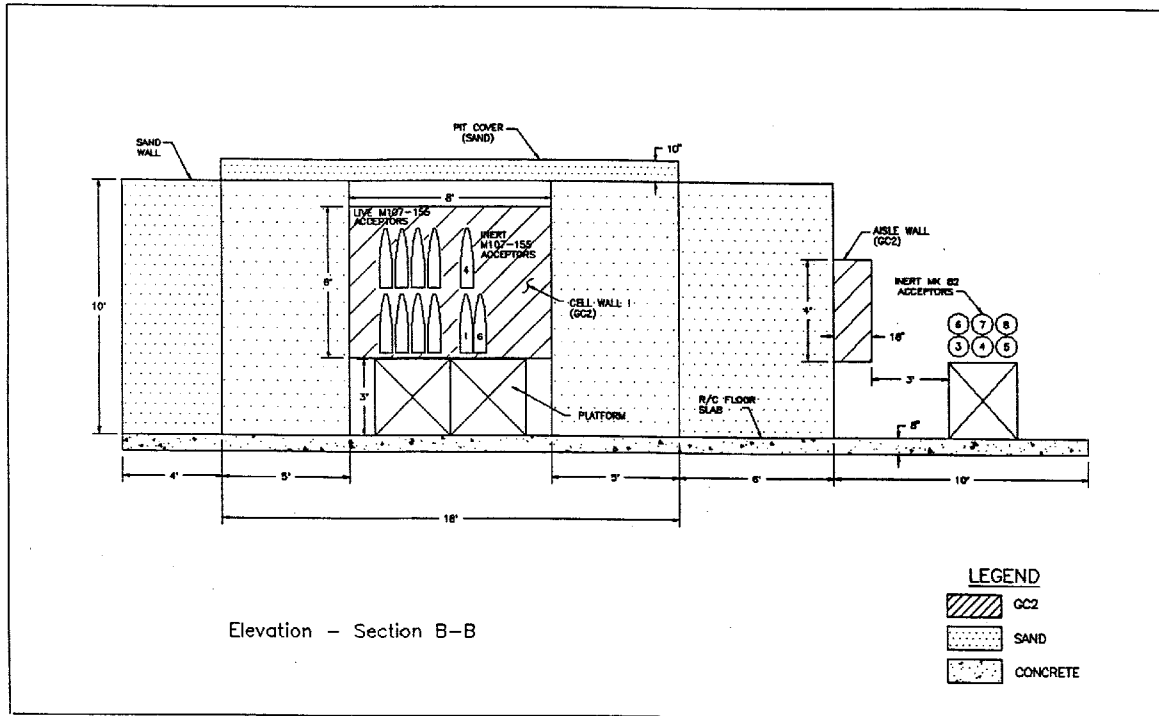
HPM Full Scale Cell Wall Test #2 - Test Setup.
